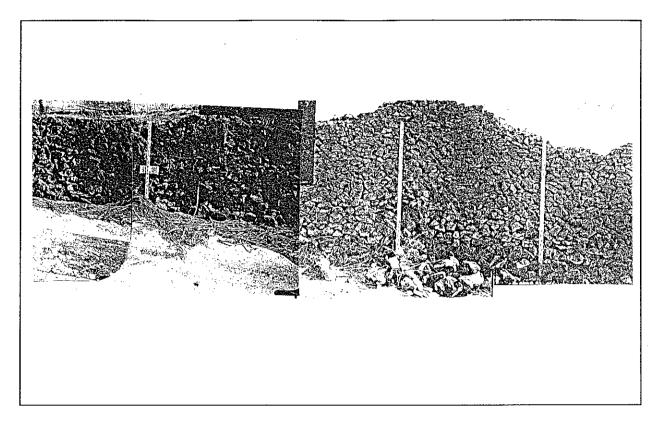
Retaining wall of bluestone spalls from MMBW photogrammetry, 1986.
